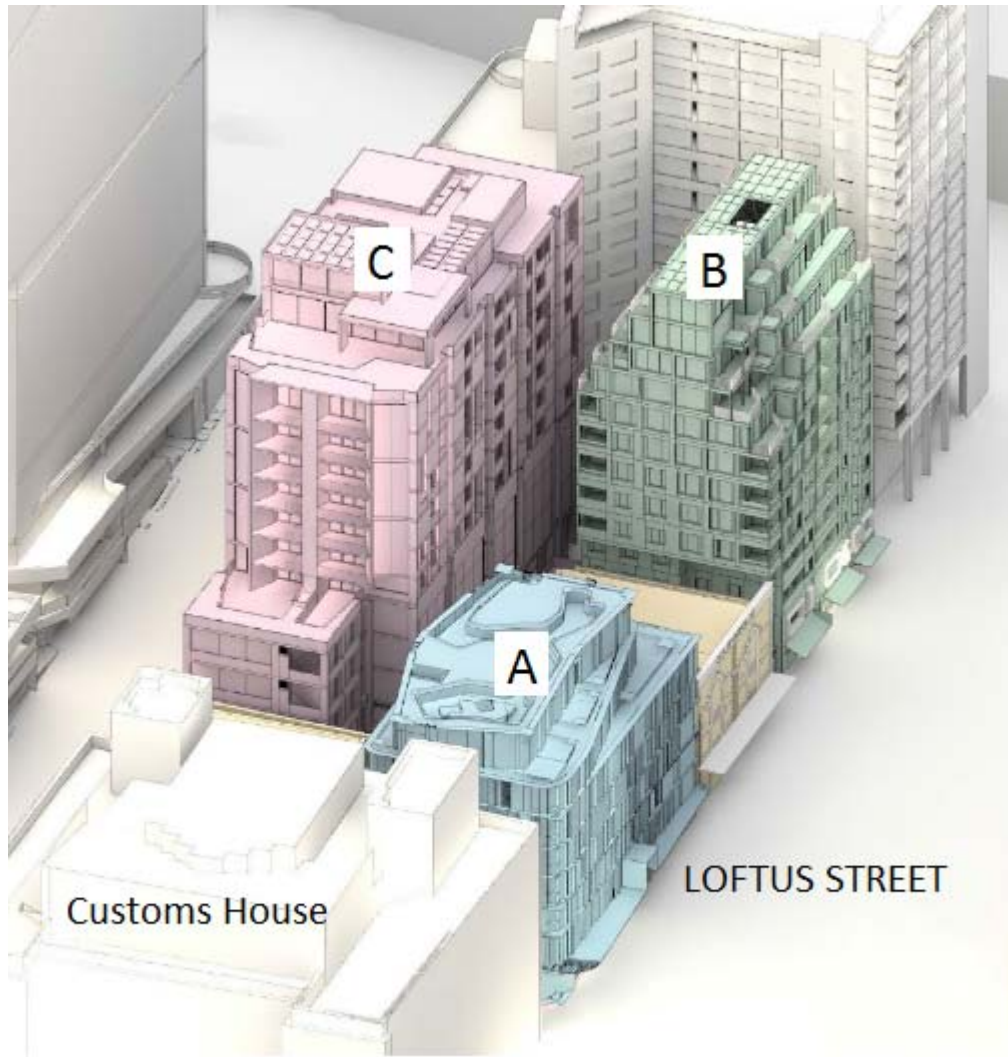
Physical model of proposed Buildings A, B and C (new buildings)
